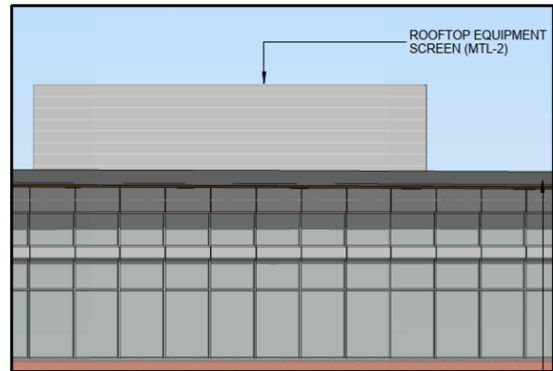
Partial north elevation; proposed mechanical equipment screening and curved glass façade
